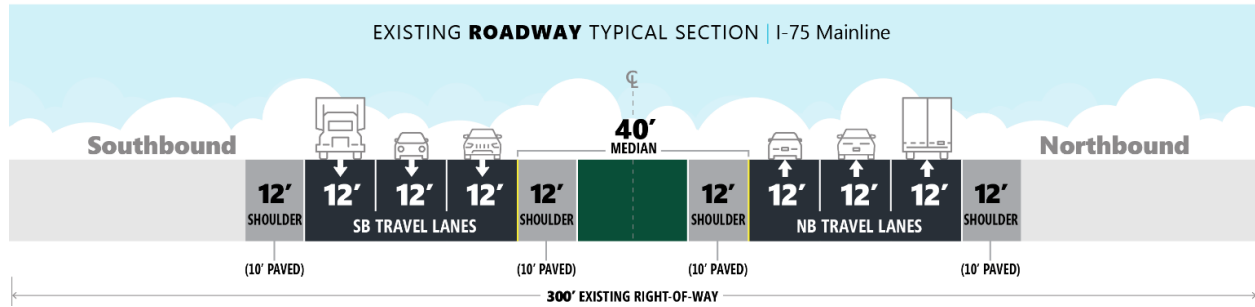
| Existing I-75 Typical Section – S.R. 200 to S.R. 326
